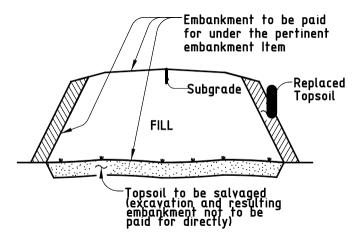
Roadway Cross-Sections Showing Payment for Excavation and Embankment
